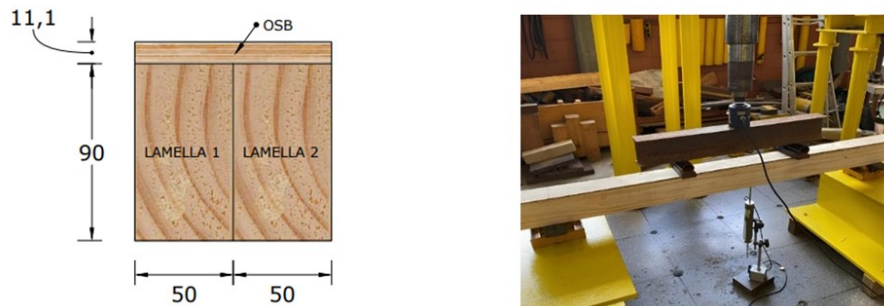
Details of NLT bending beam tests and cross section of the beam. Dimensions in millimeters (mm).
